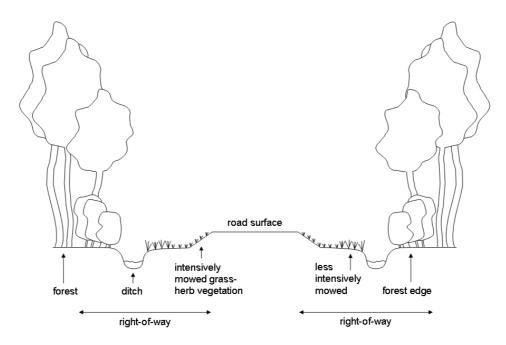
Cross-section of a road and its rights-of-way in an undeveloped forested landscape.
